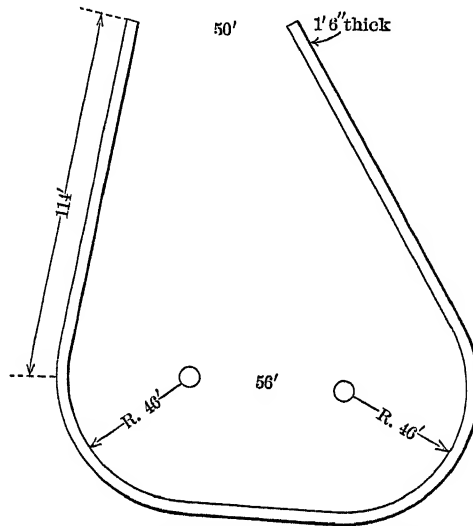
PLAN OF REINFORCED CONCRETE RETAINING WALL SHOWN IN FIG. 4.
